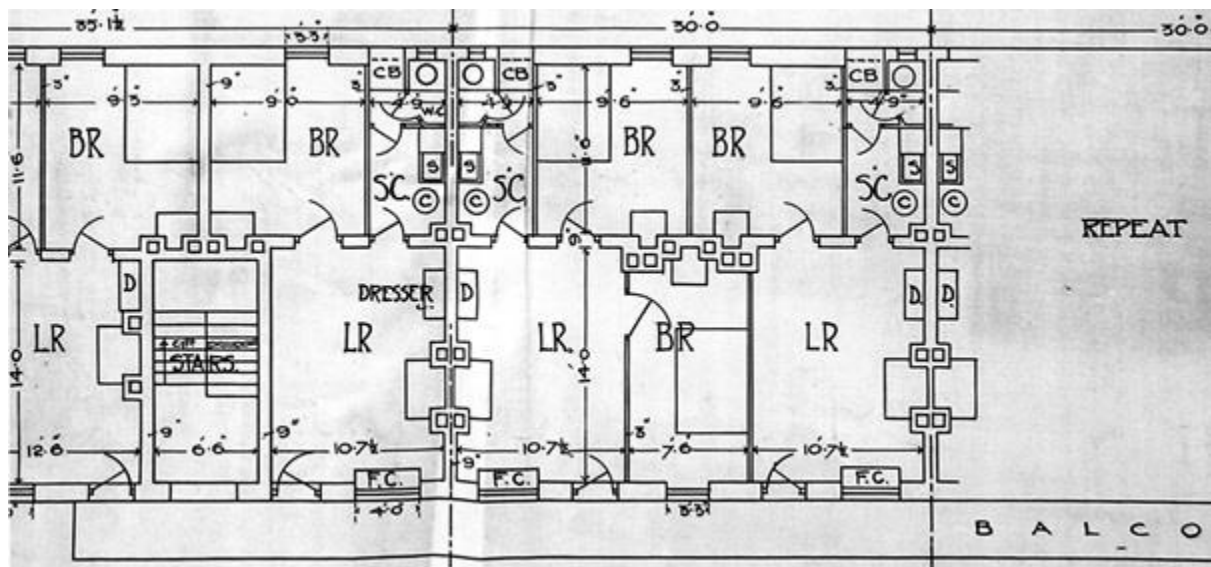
Preston Road buildings floor plan (LMA ref: LCC/AR/HS/03/059)
